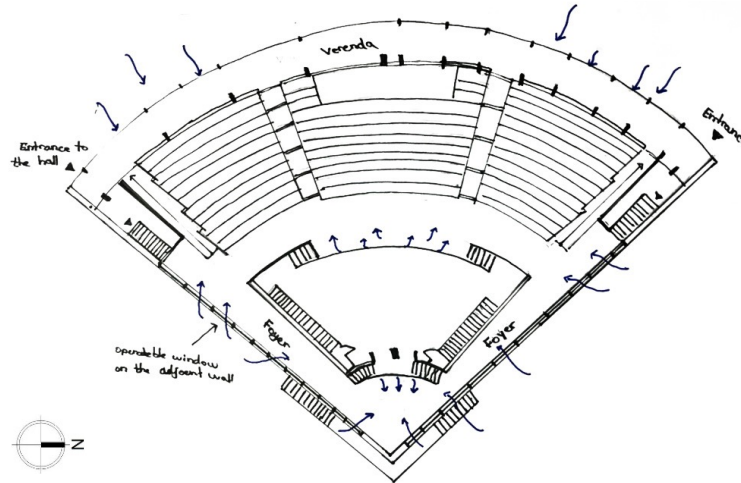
Diagram showing layout plan of Chaktomuk Conference Hall.
